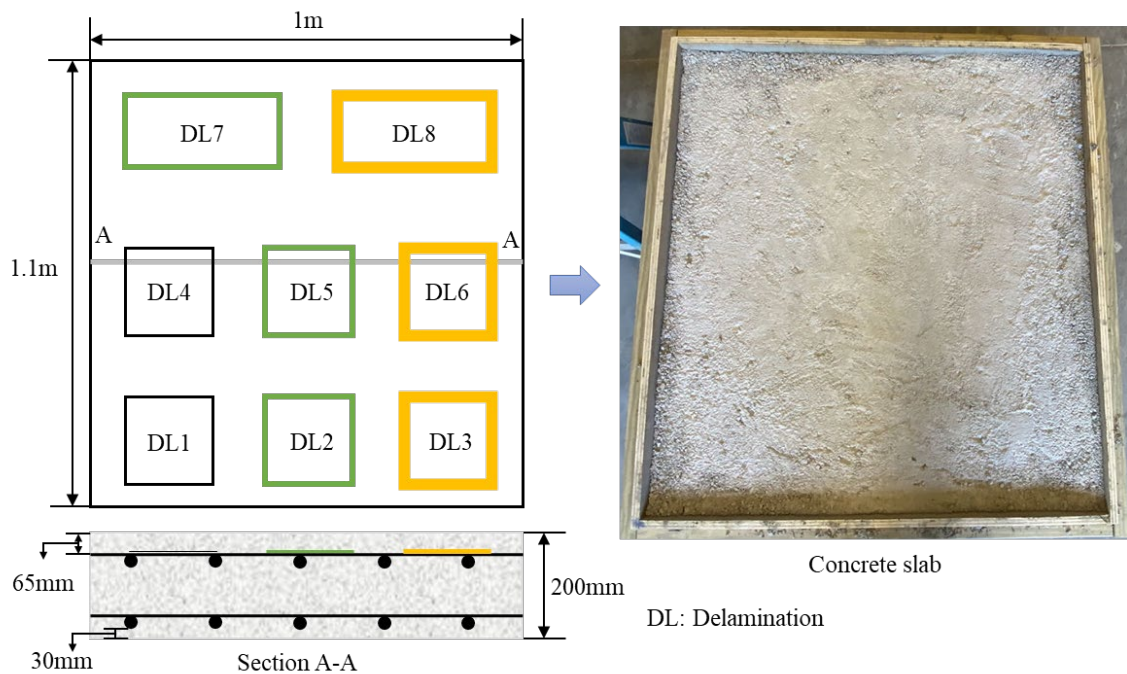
Schematic Diagram of Prefabricated Delaminations in Concrete Slab
